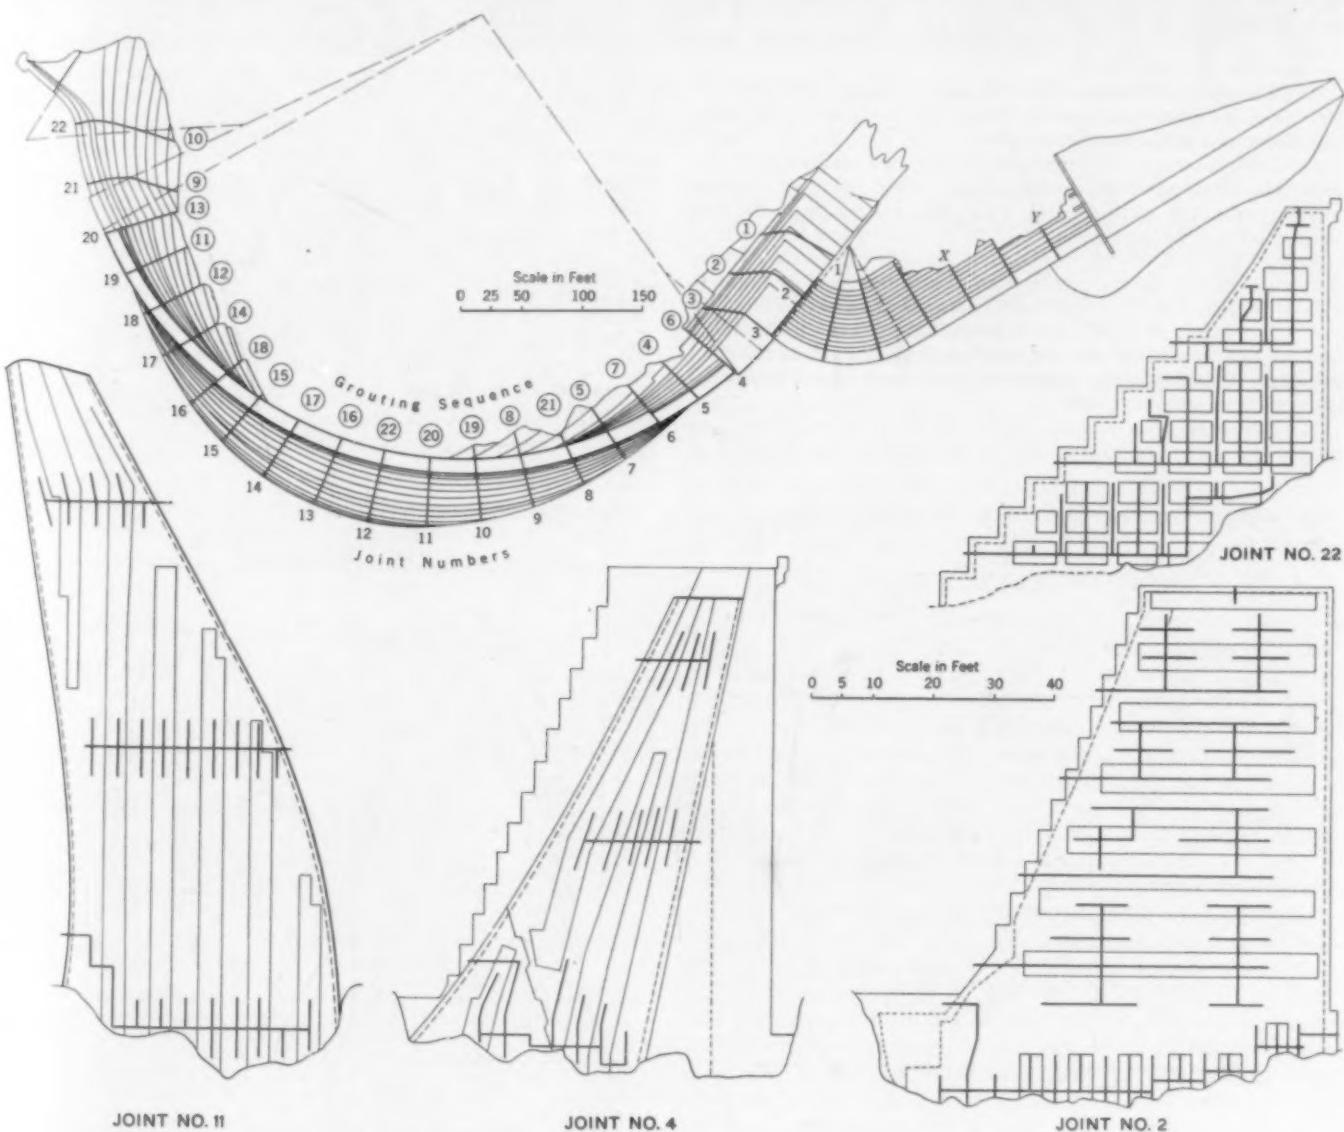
PLAN AND TYPICAL JOINTS OF HOGAN ARCH DAM
